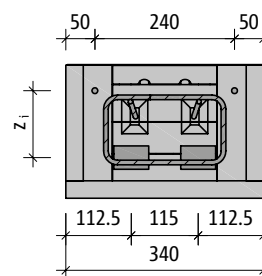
Side elevation from inside: Schöck Isokorb® type RKS10
